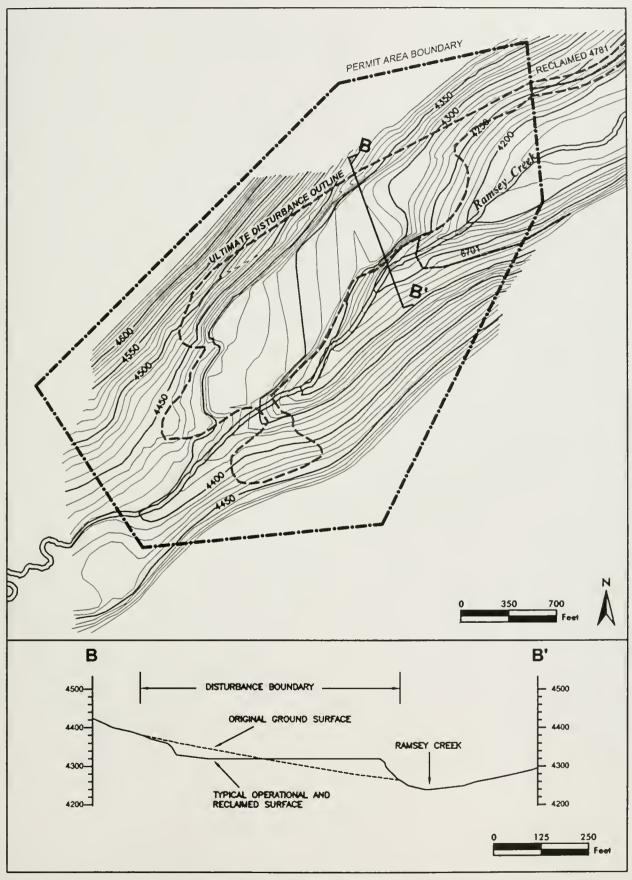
Post-mining Topography, Ramsey Plant Site, Alternative 2
